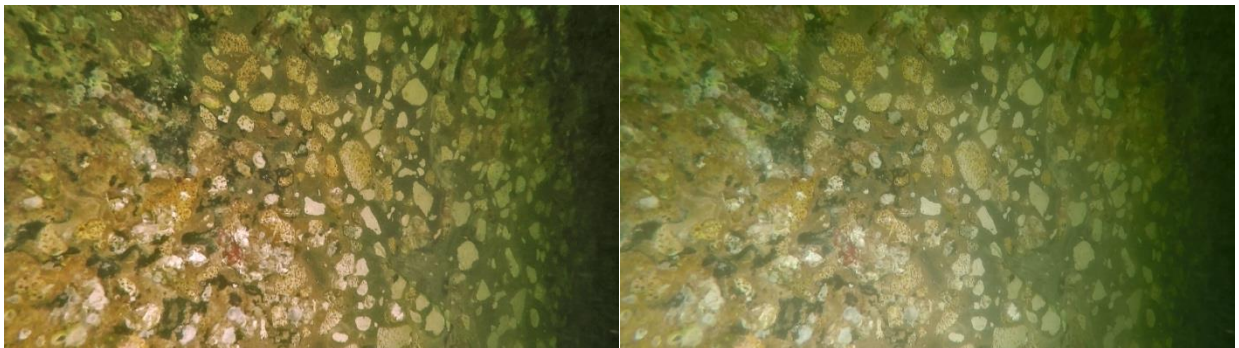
Figure 10.36, photoshopped (left) and original (right)
